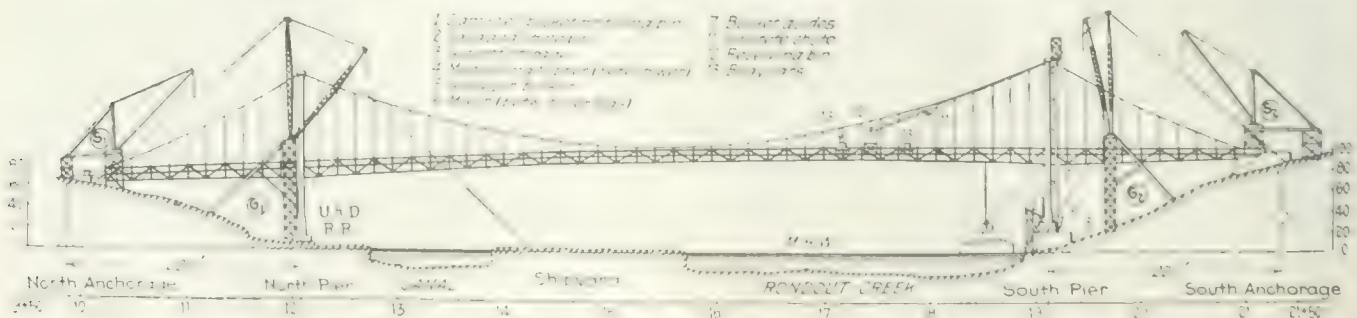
PLANT LAYOUT FOR STEEL ERECTION AND CONCRETE DECK CONSTRUCTION, RONDOUT CREEK BRIDGE
